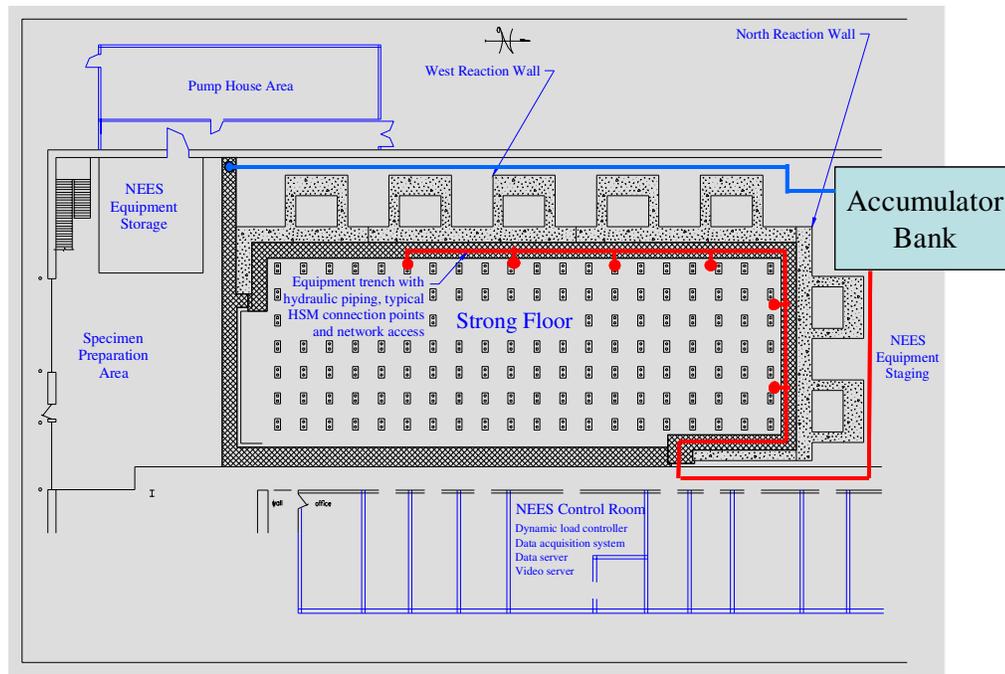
Floor Plan of ATLSS Laboratory with NEES RTMD Facility.
